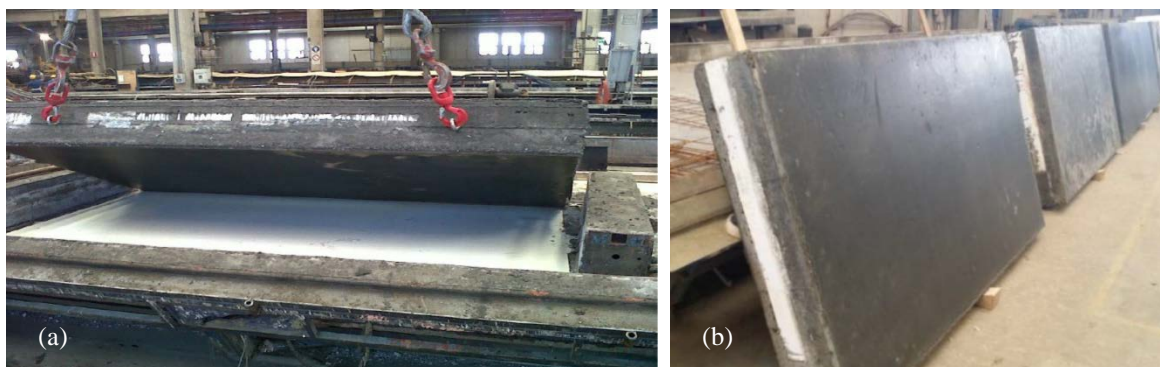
(a) SUS-CON panels demoulding, (b) cast panels (courtesy of Magnetti Building)
